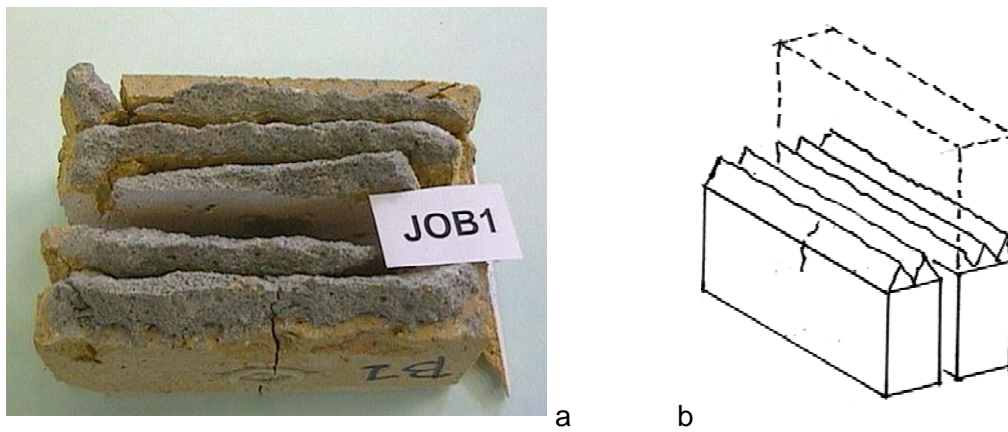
Top and bottom part of a fractured JW specimen (coded JOB1) showing inclined fracture surfaces in the mortar. Sketch, showing the top part positioned in front of the bottom part.
